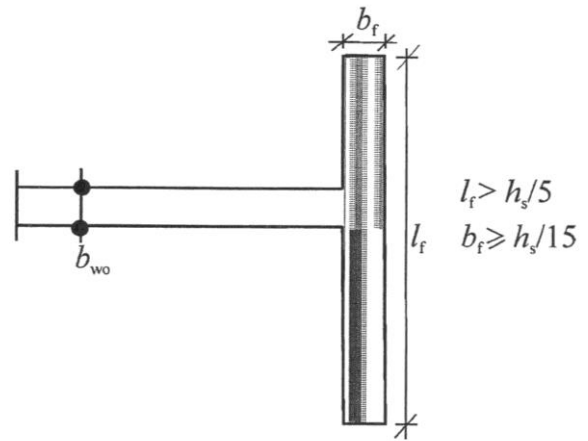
Confined boundary elements not needed at wall ends with a large transverse flange
